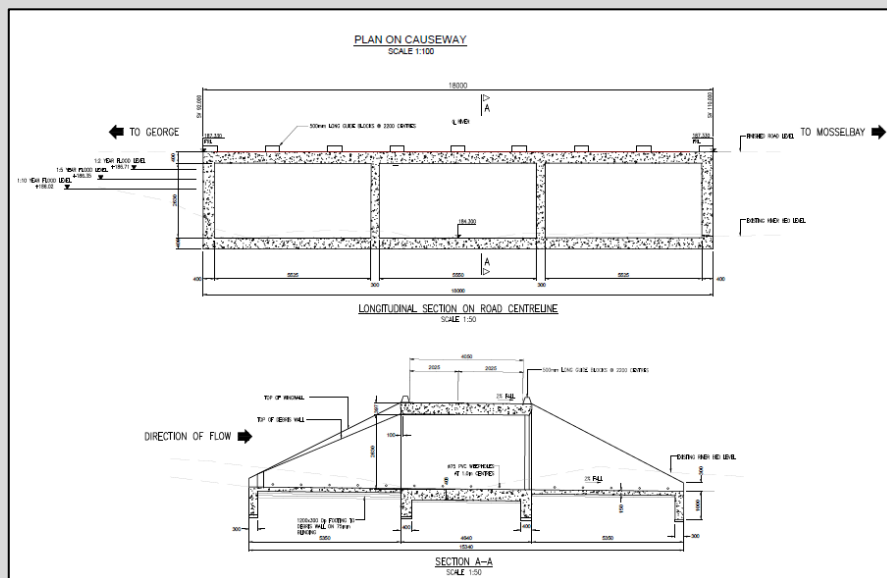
Engineering design of the proposed causeway and associated infrastructure located on DR1602 km 8.4. (Hatch Engineering, 2026).
